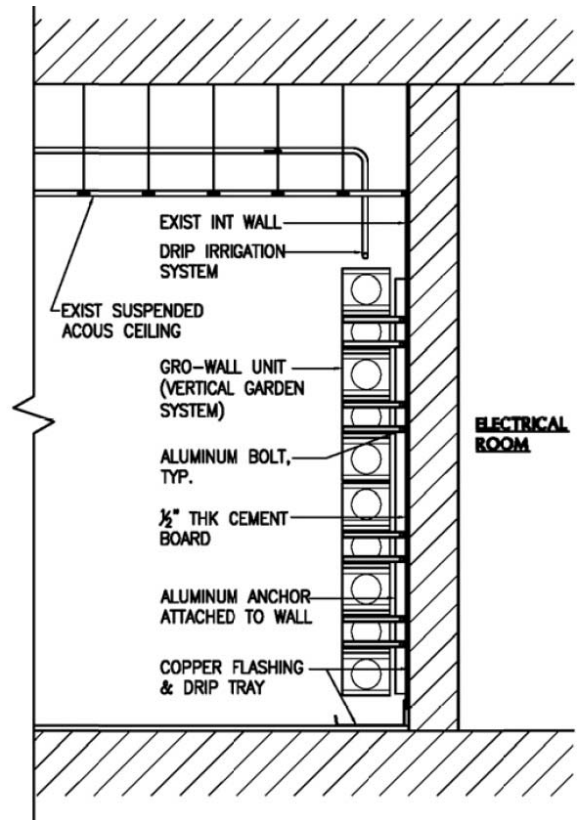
Wall Section Detail at Elevator Hall (Drawing prepared by Takao Ugai)
